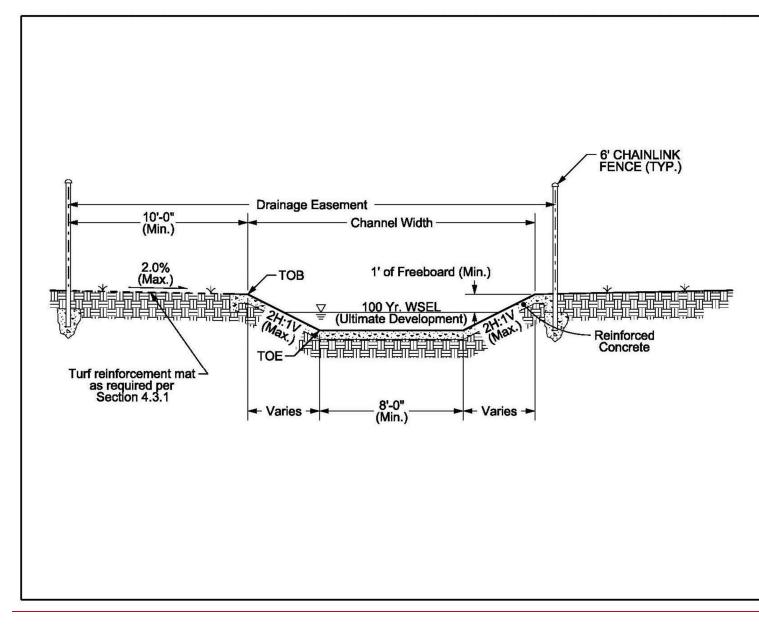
Section -View - Trapezoidal Concrete -Lined Channel
